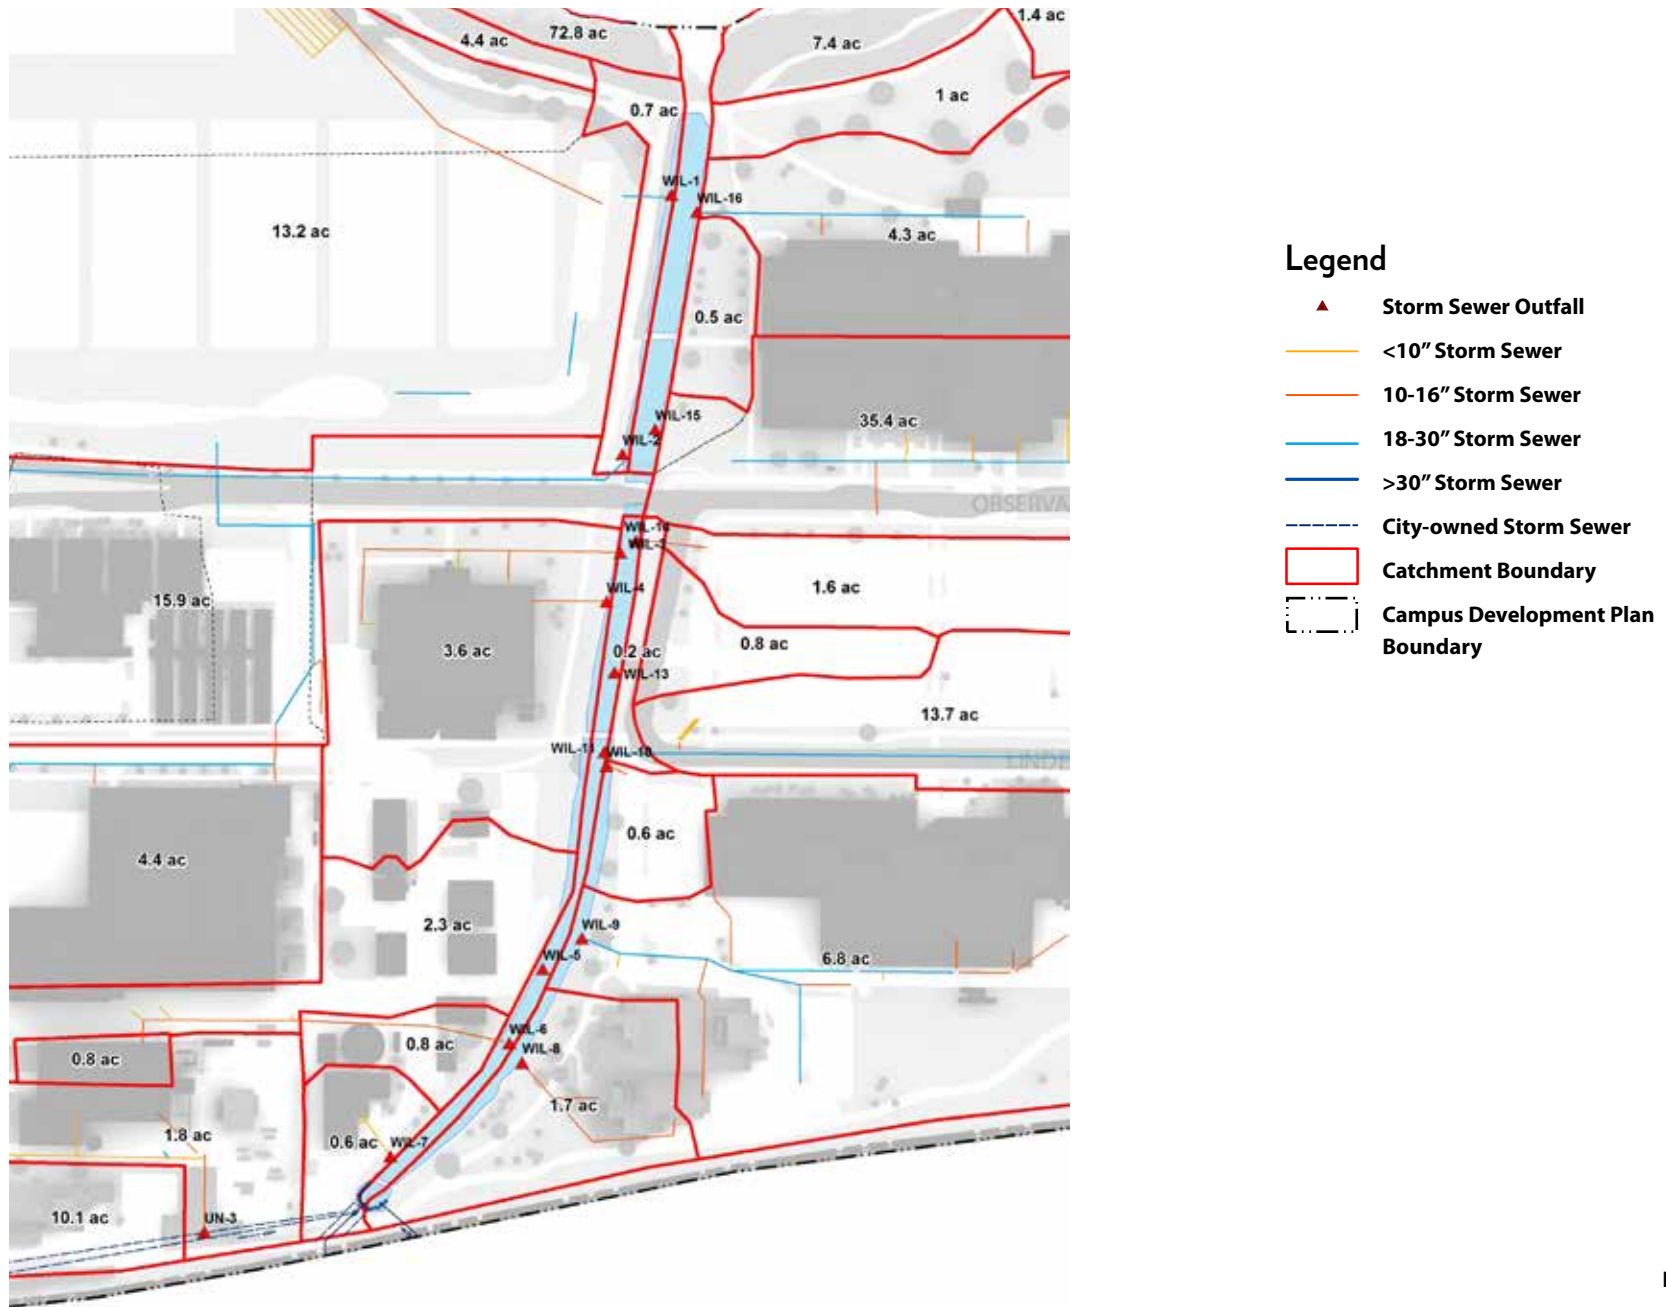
Existing Storm Sewer System and Outfalls – Willow Creek
